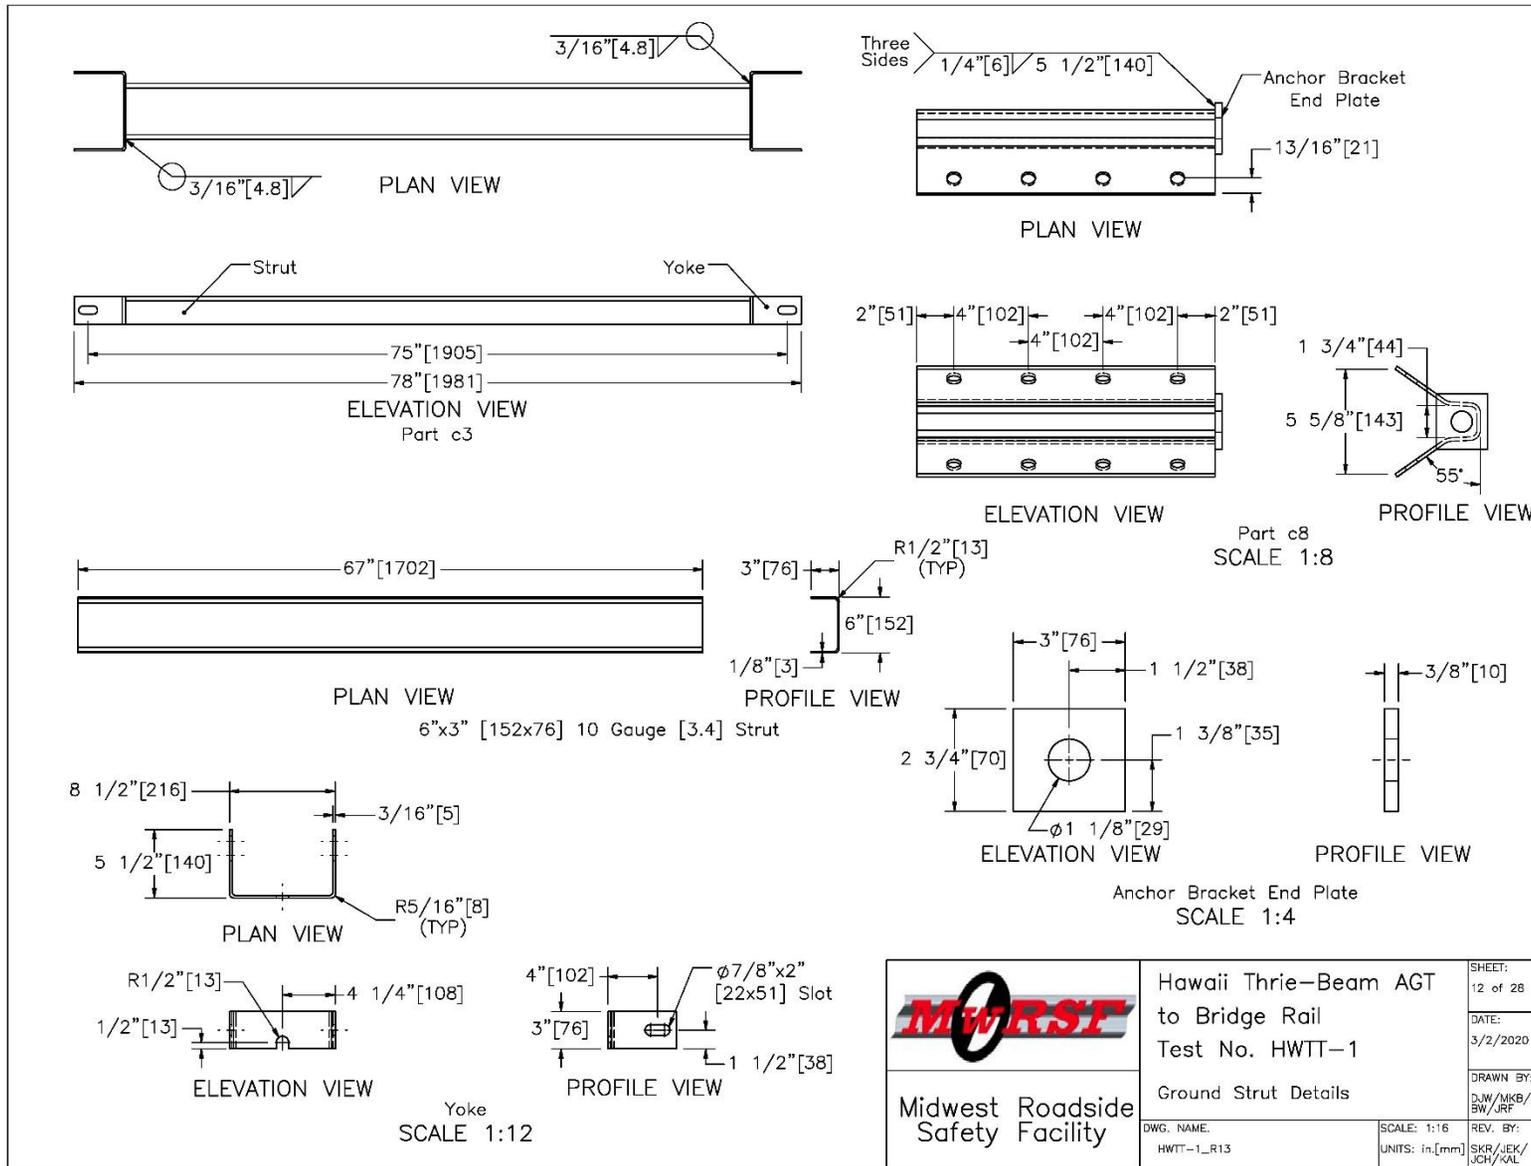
Ground Strut Details, Test Nos. HWTT-1 and HWTT-2
